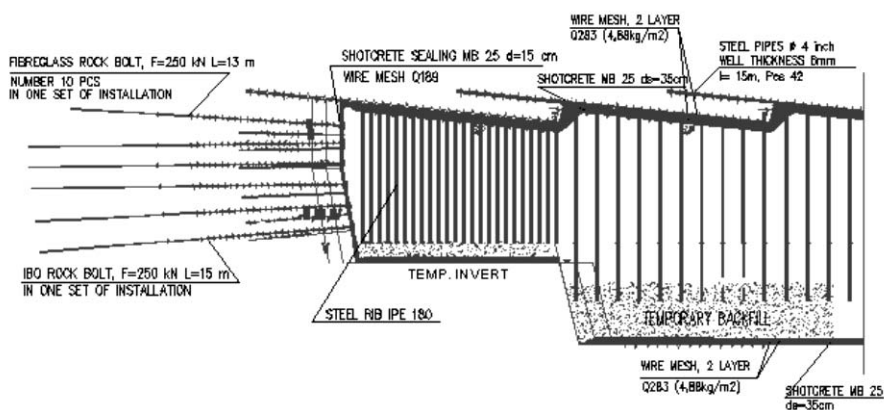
Installation of support system, which ensures quick undertaking of additional loads due to excavation tunnel.
